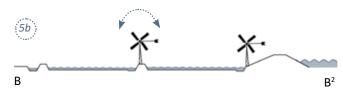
The system can be expanded by excavating other terrains. Again excavated soil can be used to enforce the flanks of the excavated fields.
